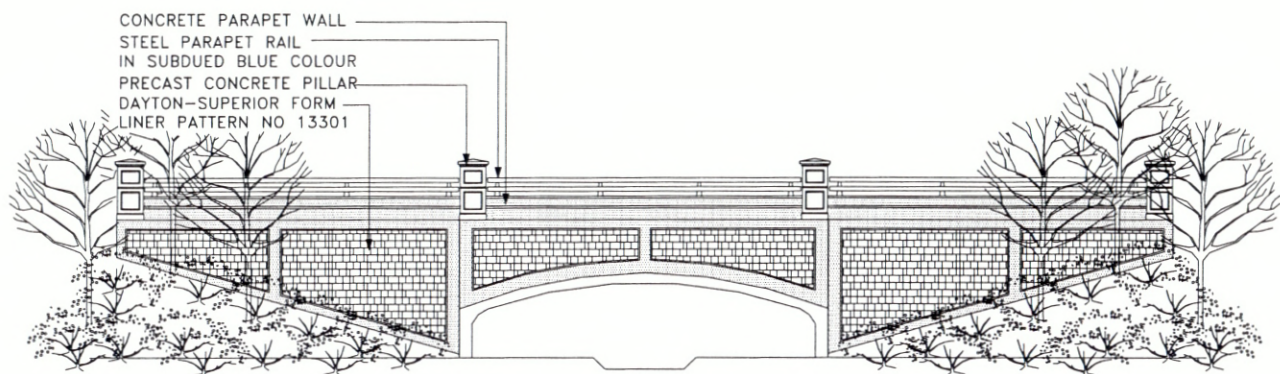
ELEVATION OF VEHICULAR WATERCOURSE CROSSING N.T.S.
